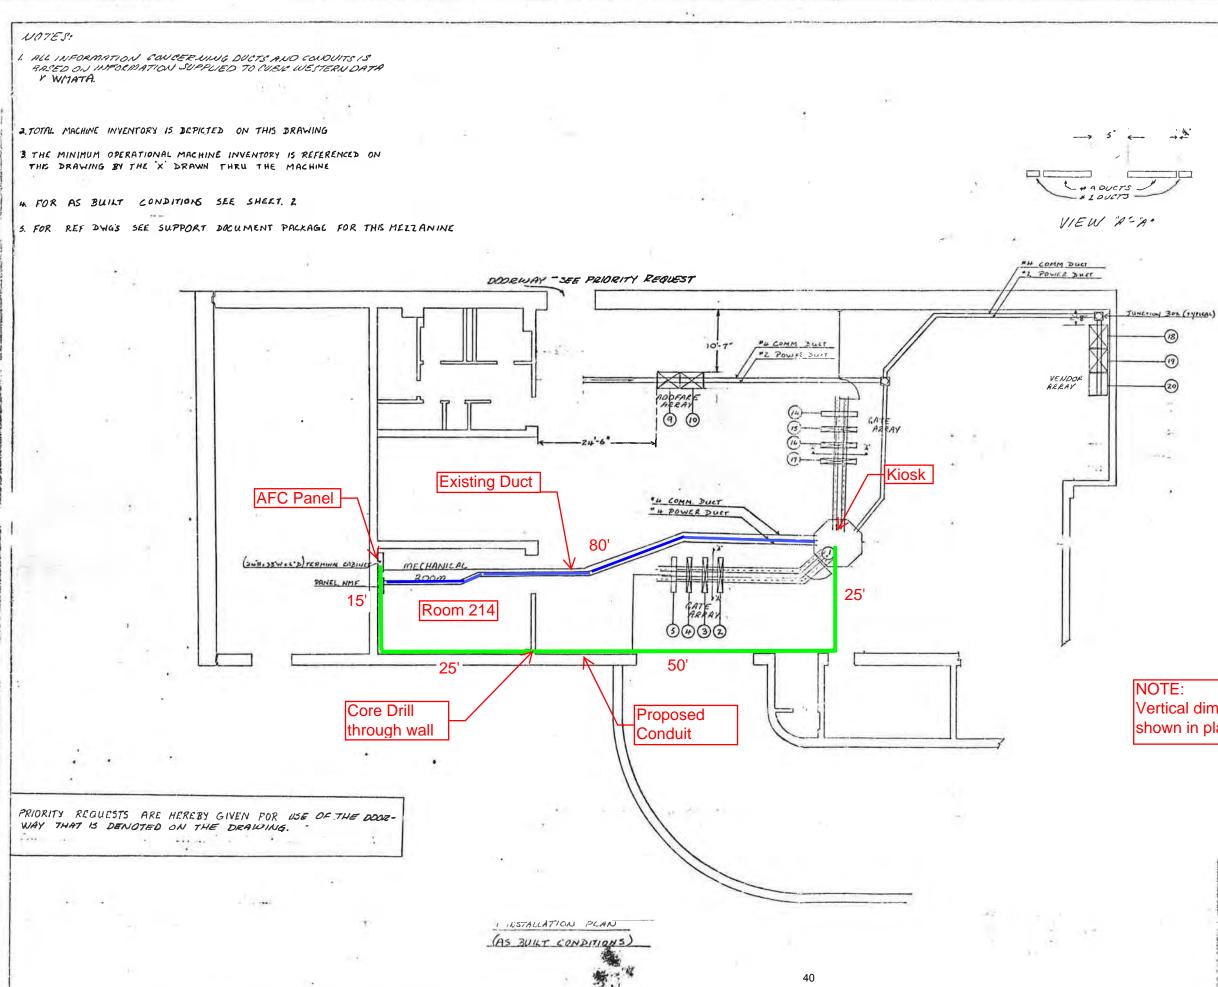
Proposed conduit run connecting to AFC Panel inside Mechanical Room 214
